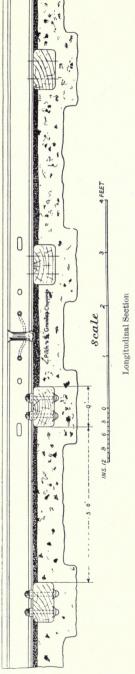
Details of Track Construction, Belle Vue Road Section, Leeds Tramways.
